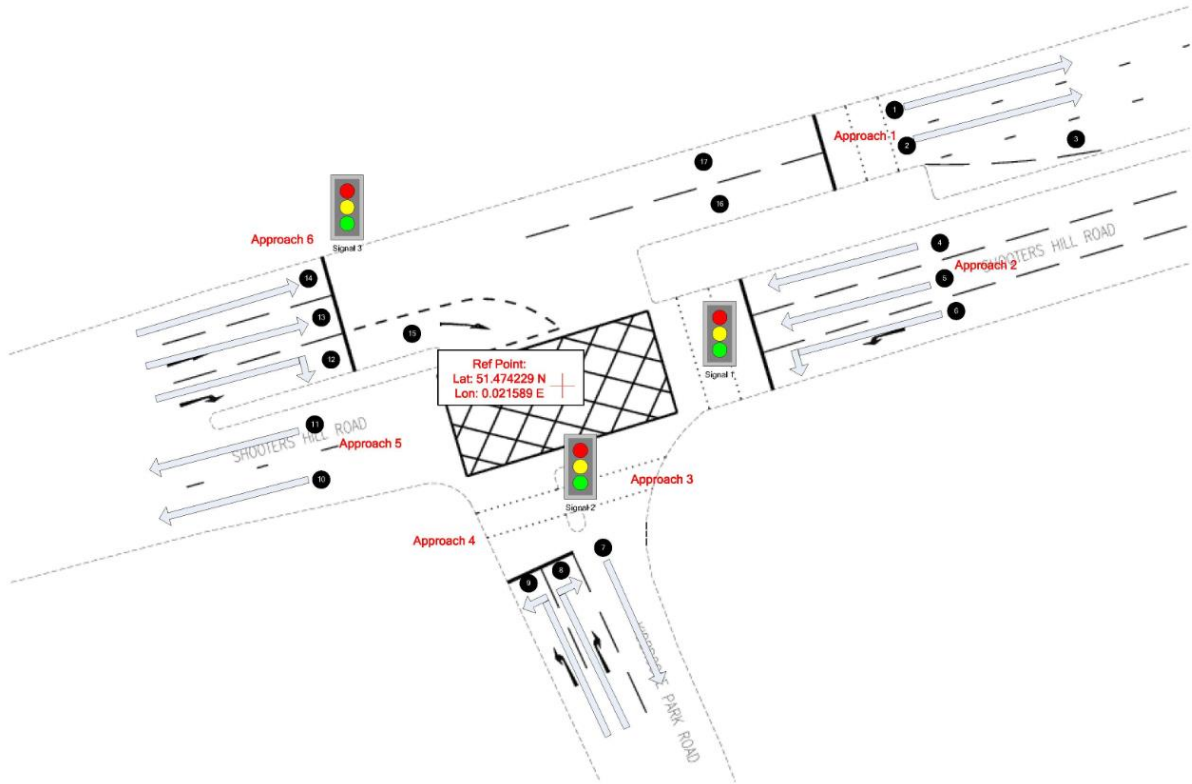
A2 Shooters Hill / Kidbrooke Park Road (site reference 06/021)
